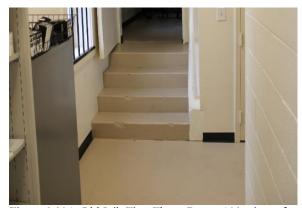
, Old Jail, First Floor, Room 102, view of the concrete stair between Rooms 101 and 102. Note the small areas of loss at the ends of the treads.
